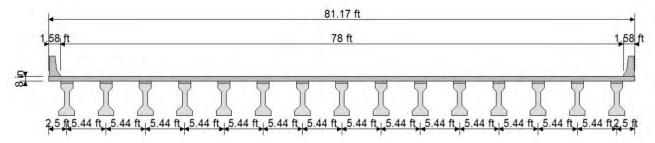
SR30 over Cotton Lane, Typical Section (AASHTO Type IV)
